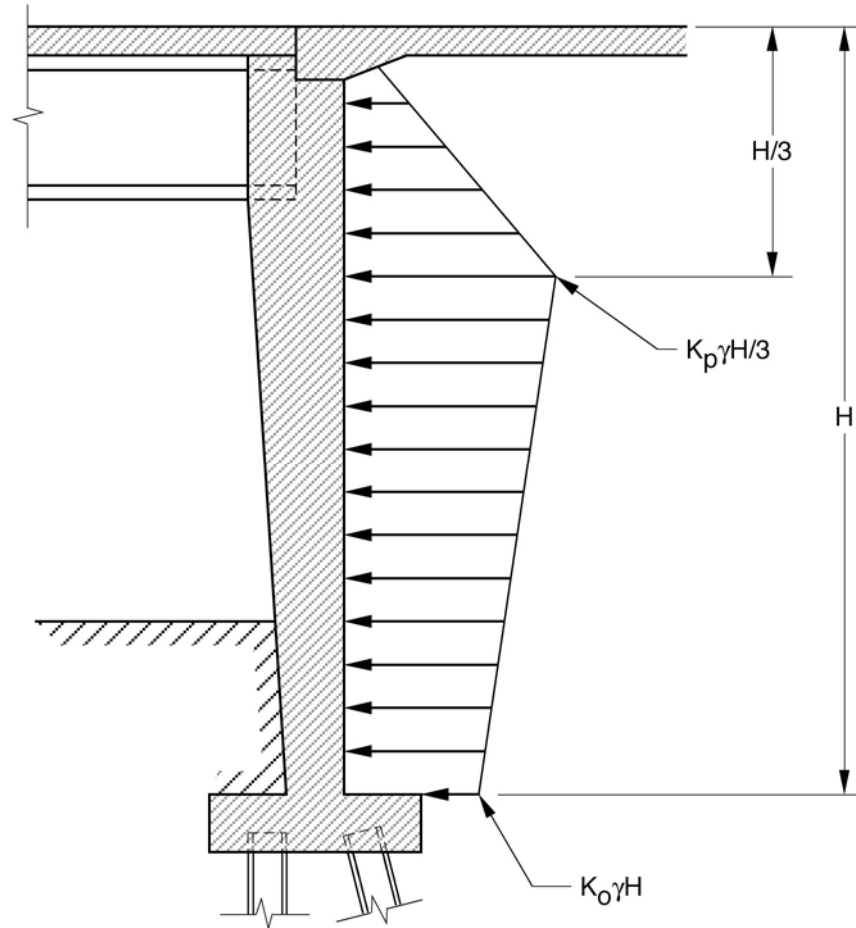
Design envelope for full-height wall abutments based on passive and at-rest pressures.
